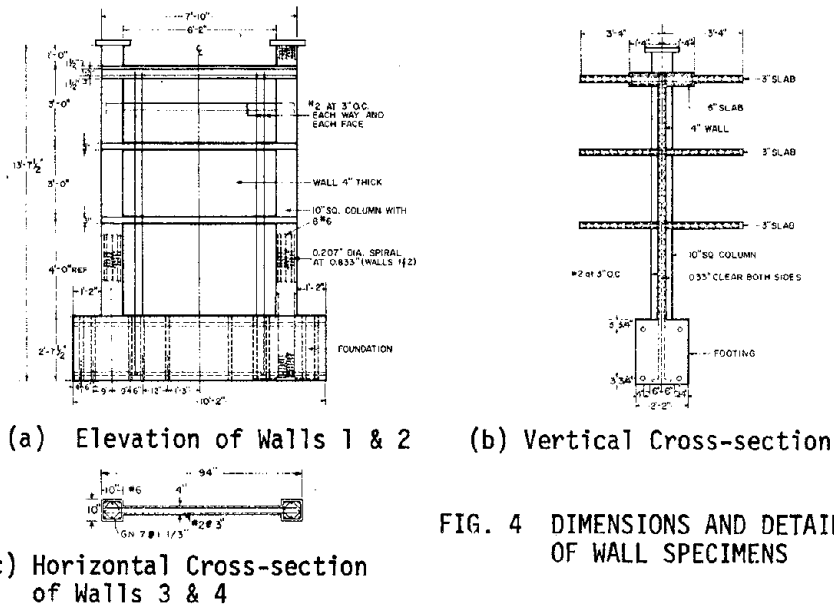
DIMENSIONS AND DETAILS OF WALL SPECIMENS
